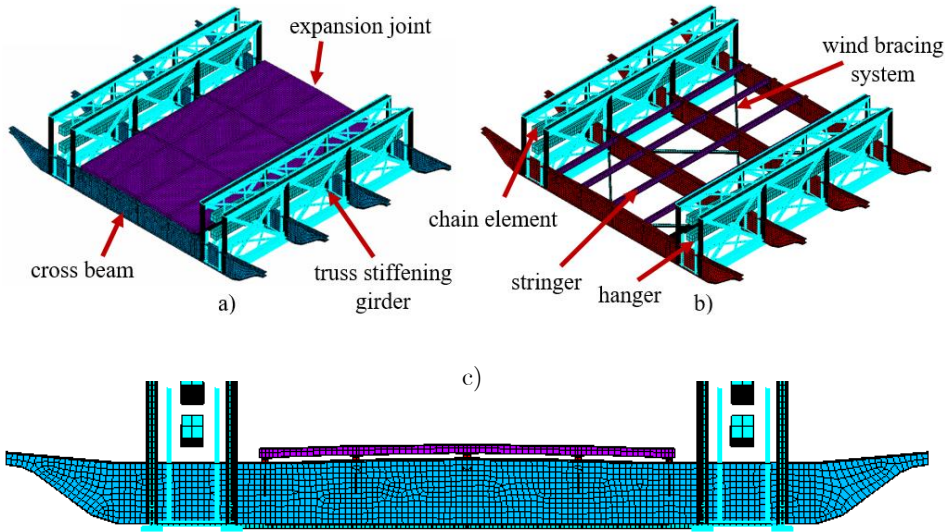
Isometric view of the model a) with and b) without reinforced concrete slab, c) cross-sectional view
